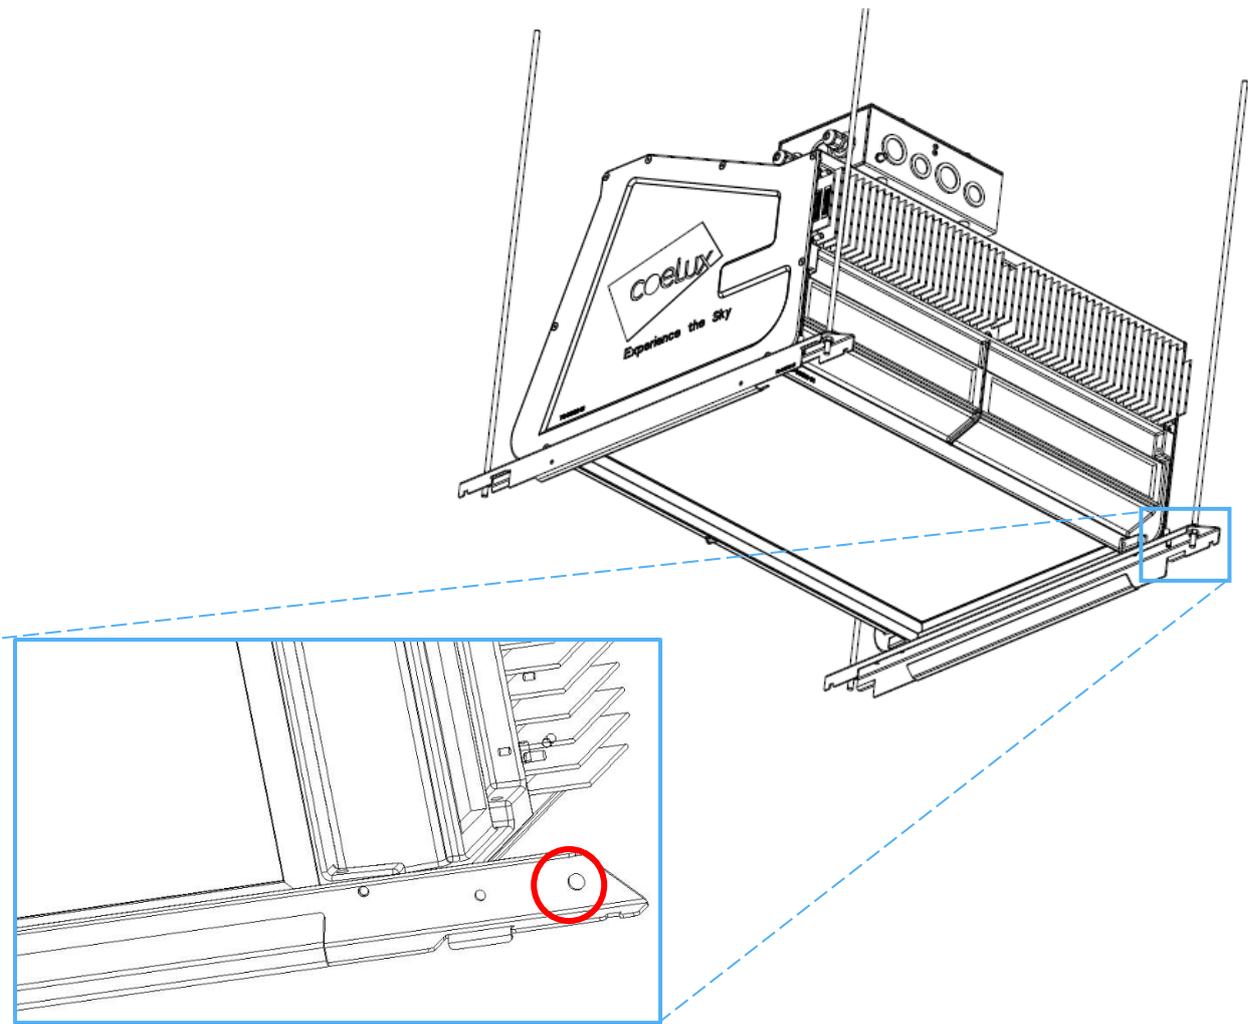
Mounting to the structural ceiling: step C. Detail: seen from below.
